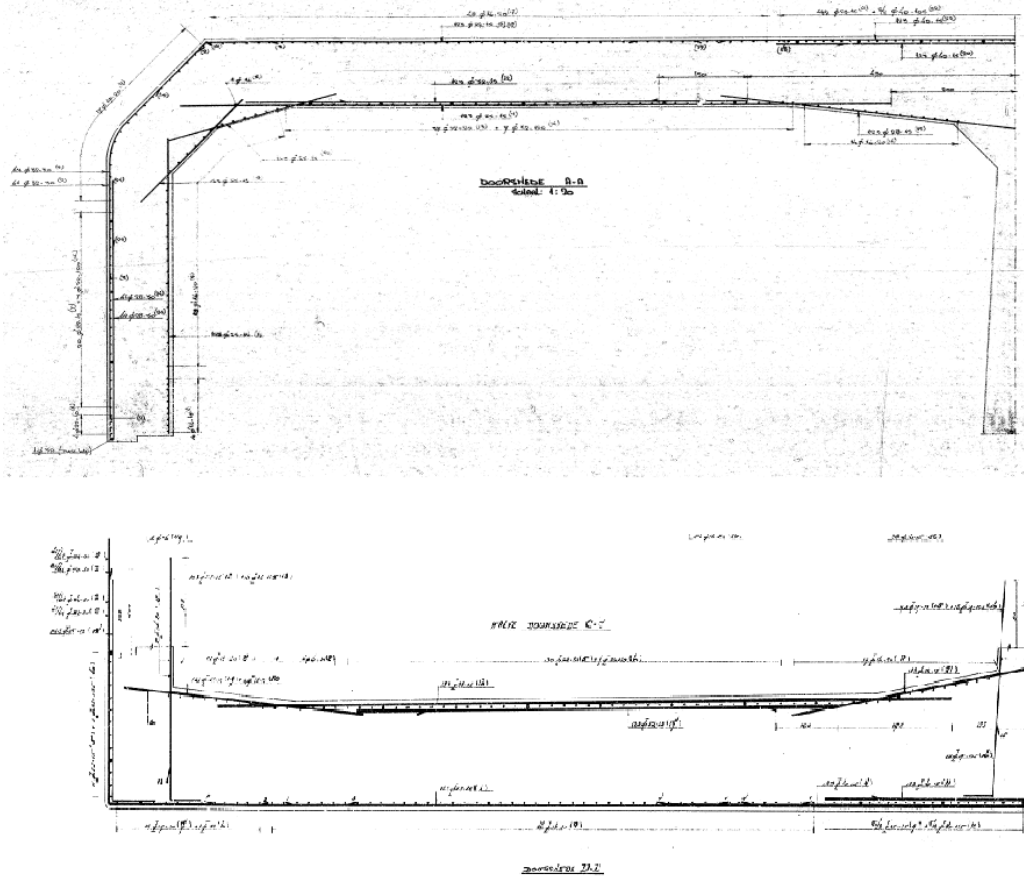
Reinforcement drawings 1e Heinenoordtunnel
